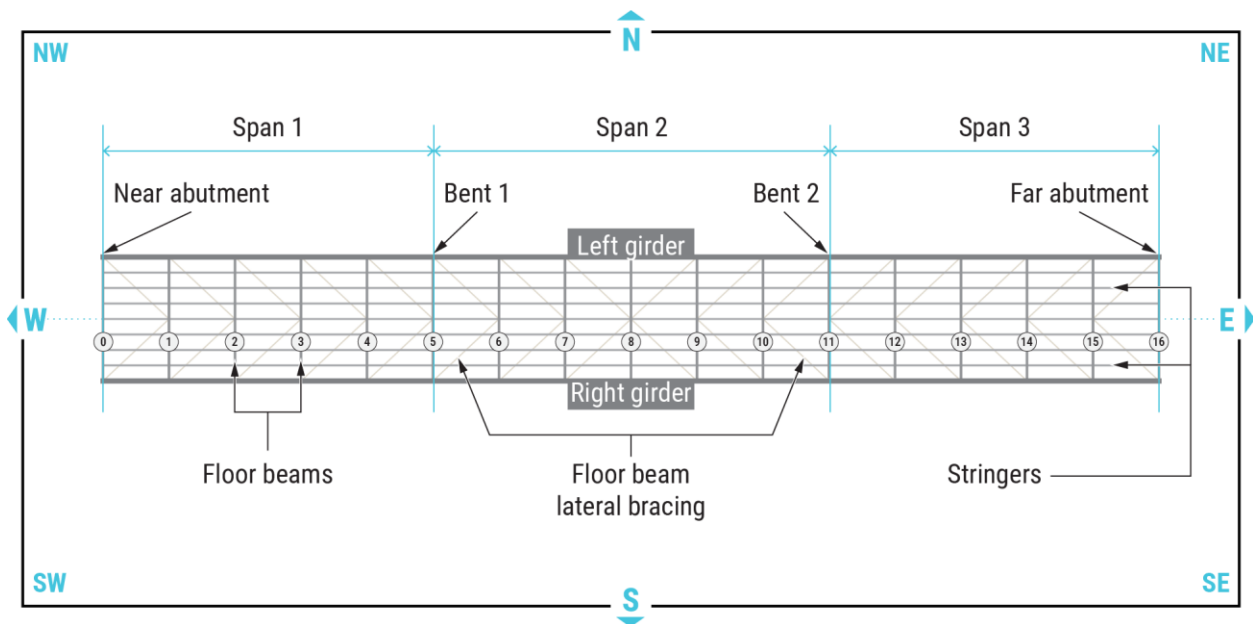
Overhead view of Fern Hollow Bridge showing floor beams and spans. The floor beams were numbered sequentially from left to right, with floor beam 0 positioned directly above the west (near) abutment and floor beam 16 positioned directly above the east (far) abutment.
